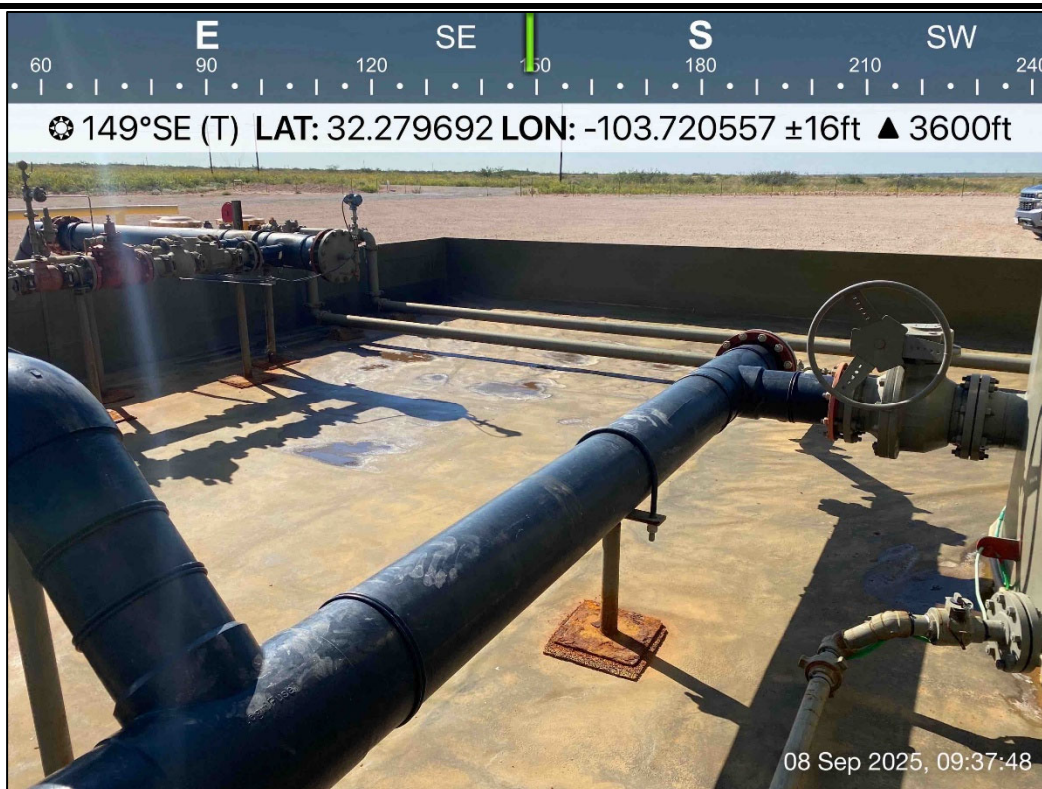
Southeastern view during liner inspection activities. 9/8/2025
